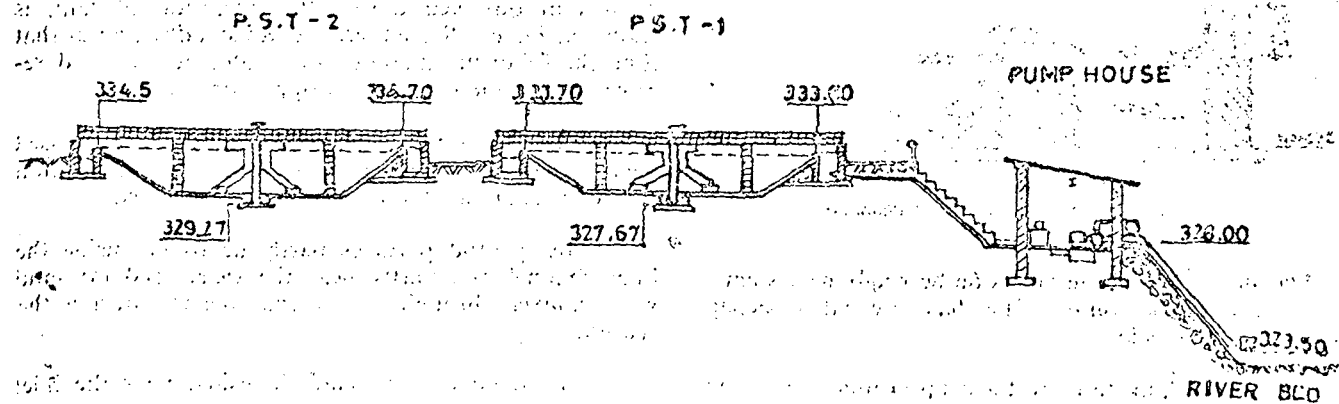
Longitudinal section through PS tanks 1 and 2 and pump house
